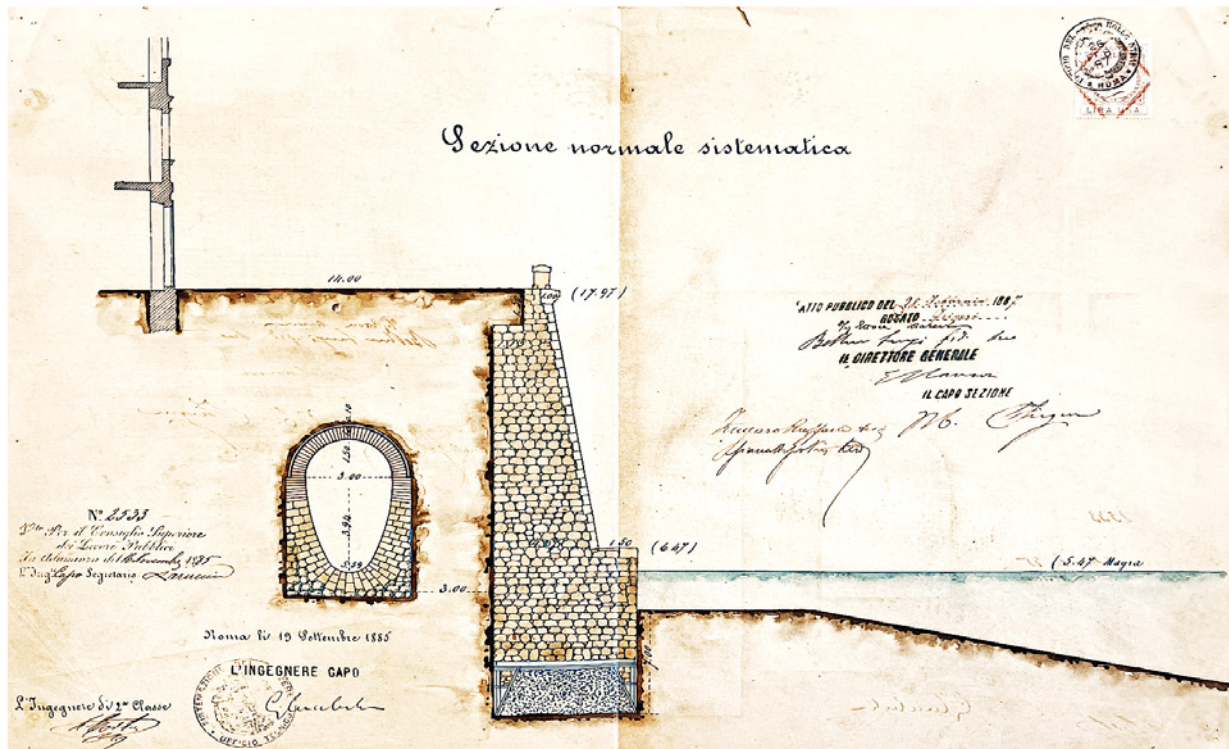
Special Office for the Tiber's settlement, construction drawings of the retaining walls with wrought-iron caissons, 1885 (courtesy of Rome State Archive, USTRA collection).
